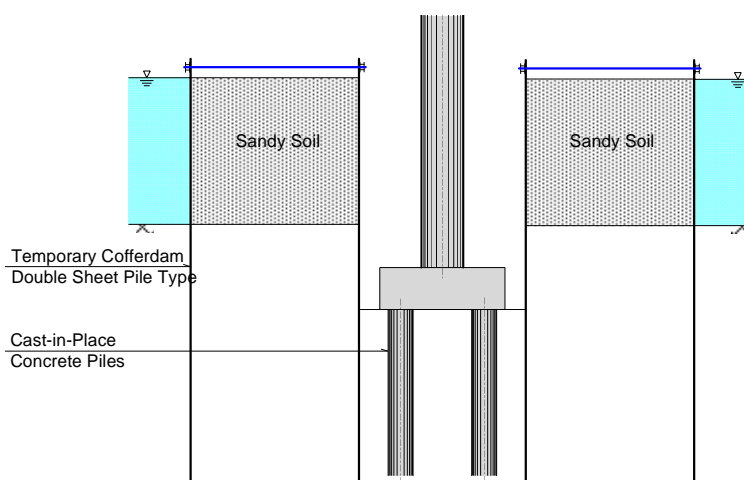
Use of Steel Pipe Sheet Piles around Existing Structures
